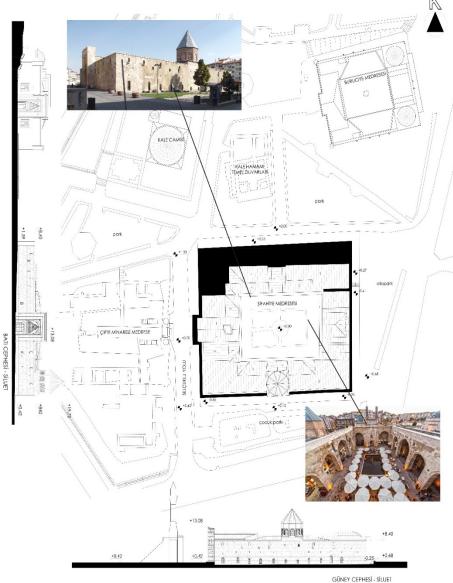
Sifaiye Madrasa Situation Plan and silhouettes (T. R. Directorate General of Foundations (VGM) archive was used)
